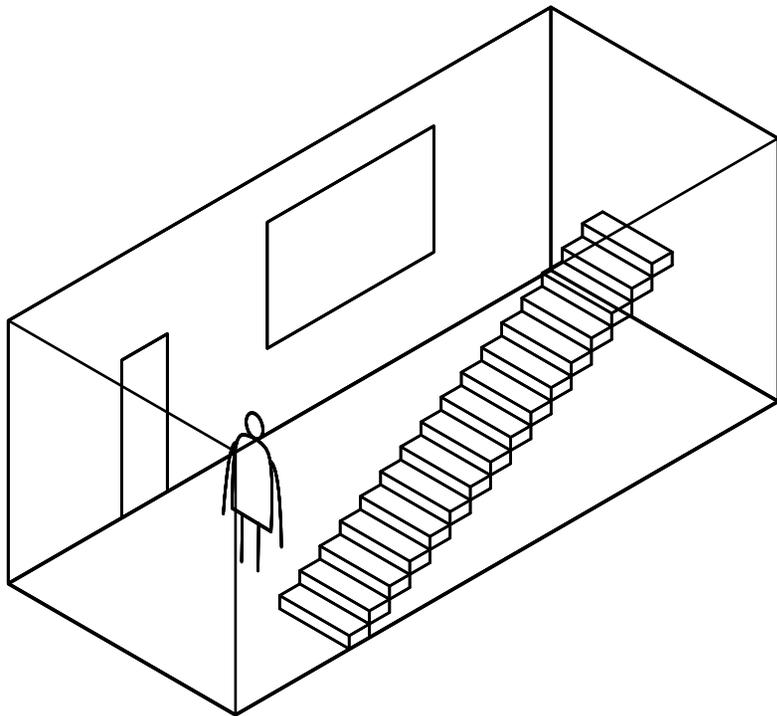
The Elements of Architecture (Floor, walls, ceiling, door, windows and stairs all have their role in terrestrial gravity)
